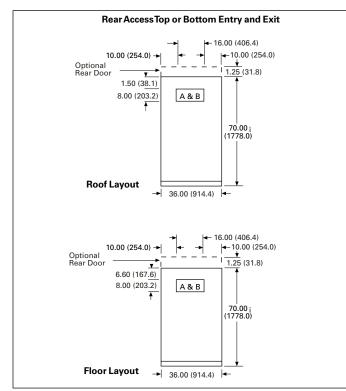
5 and 15 kV Roof Layouts and Floor Layouts
